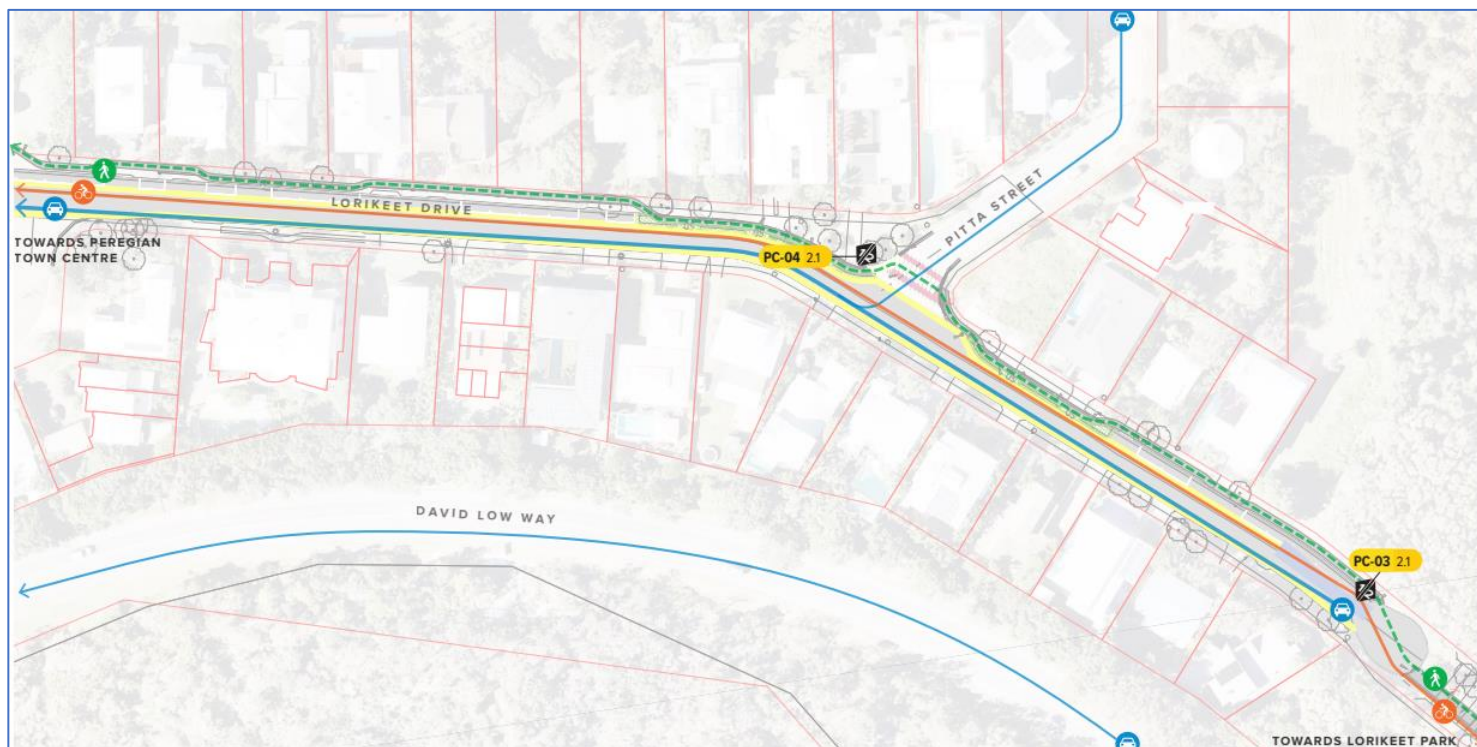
Concept design Lorikeet Drive (Pitta Street towards Lorikeet Park)
